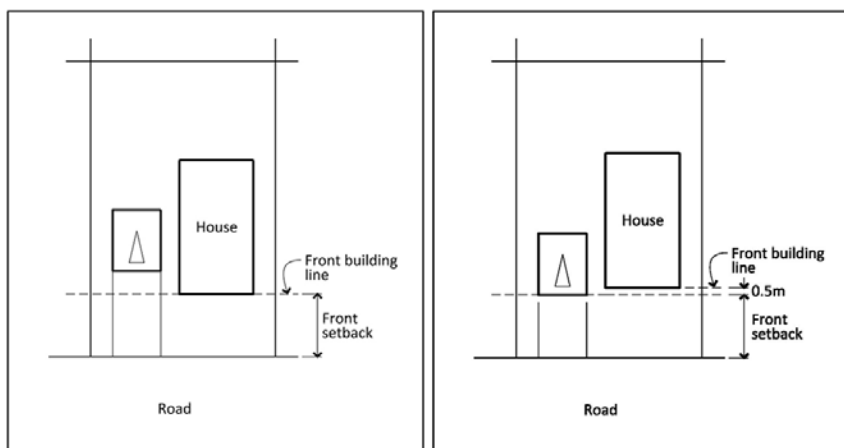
Setback for accessory buildings – example of a detached accessory building
